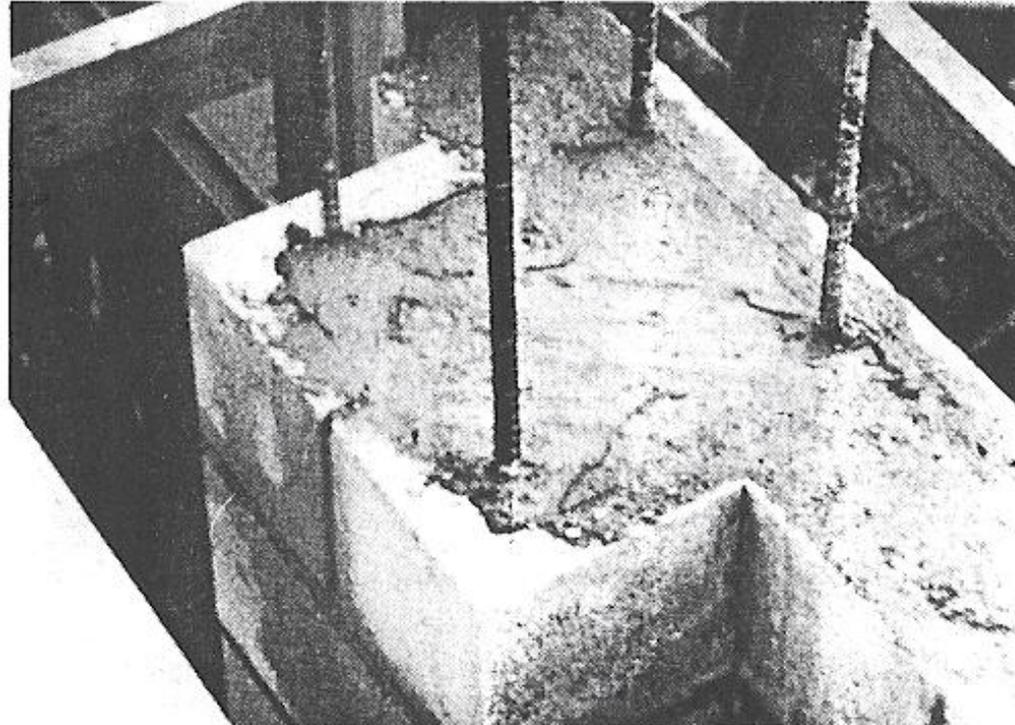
Large cavities in masonry sections made up of two or more units and containing vertical joints, such as this pilaster, require sufficient time for the mortar to cure before grouting.
